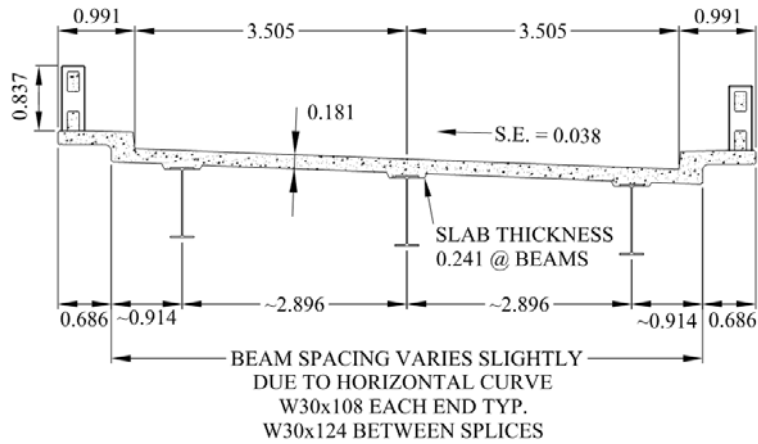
Entrance ramp to James White Parkway: typical cross-section (m)
